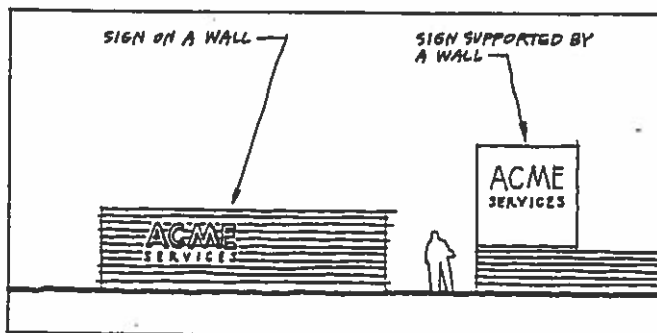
B. SOME EXAMPLES OF LOWER GROUND SIGNS ON WALLS
